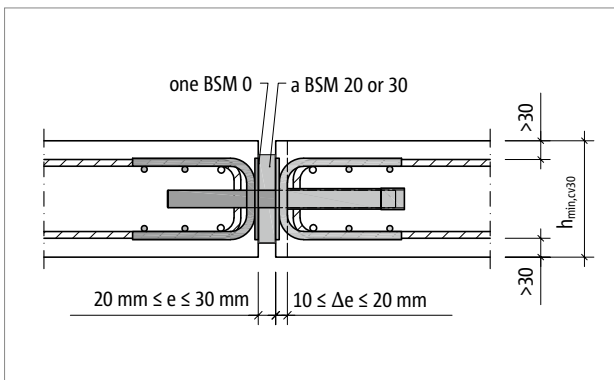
Positioning of the fire protection collar with a joint width of 20 or 30 mm and a maximum joint opening of 20 mm
